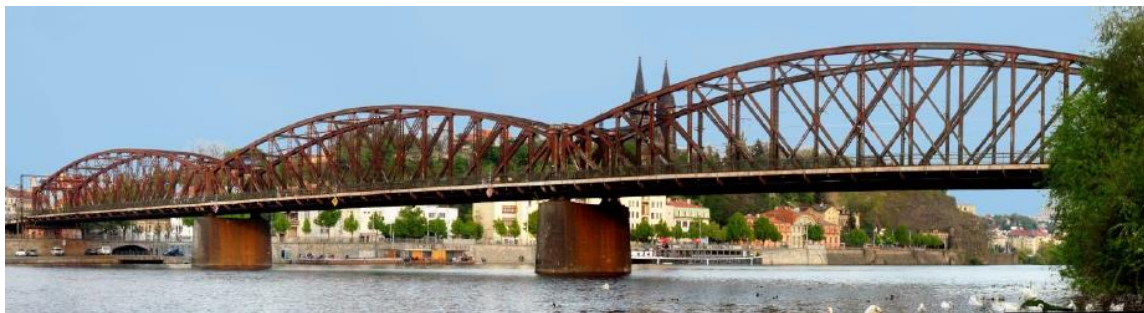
Steel Bridge near Vyšehrad. Ref. [2]
